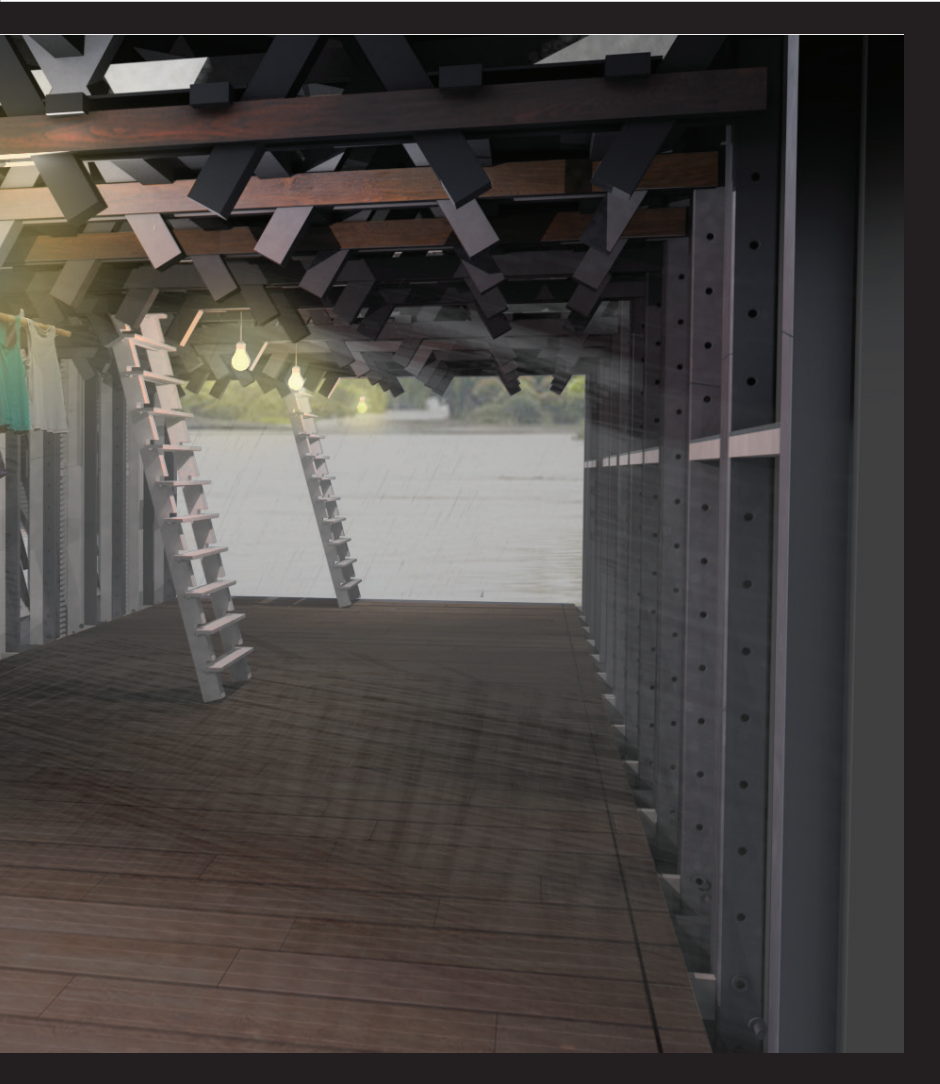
Roofing and Structure Detail - Timber Unit Construction
